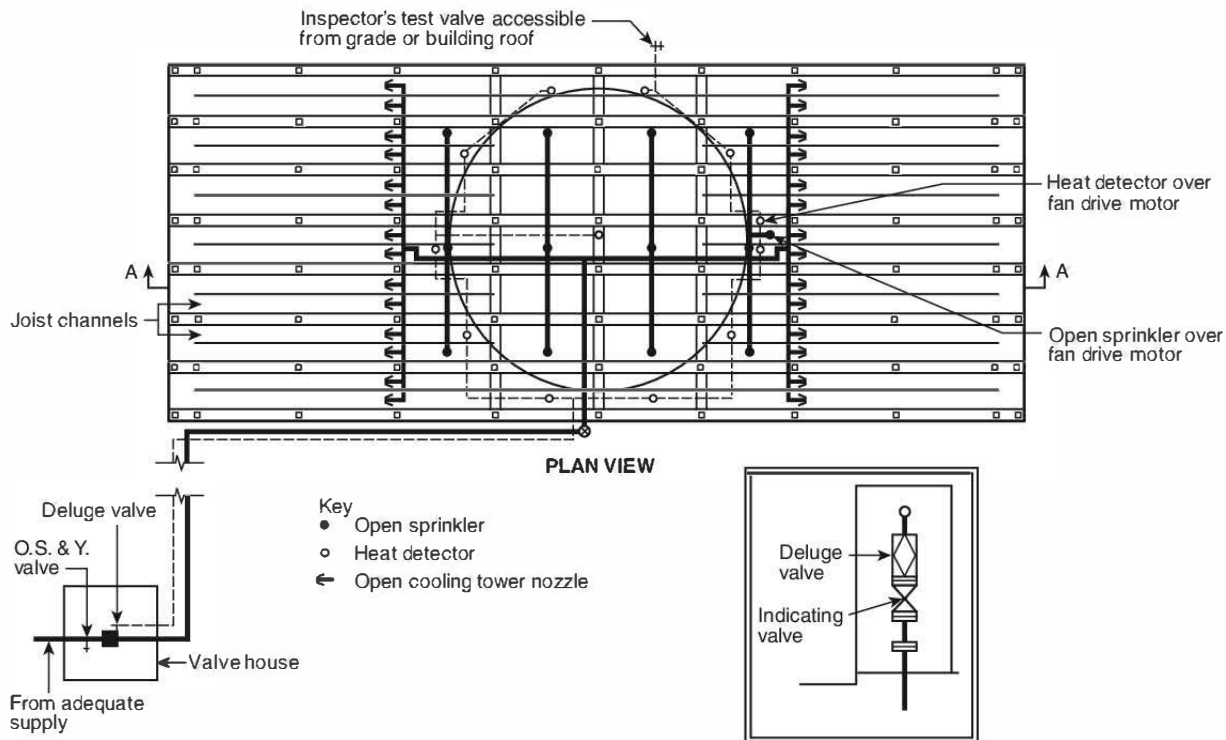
(a) Plan View, Typical Deluge Fire Protection Arrangement for Crossflow Towers.
